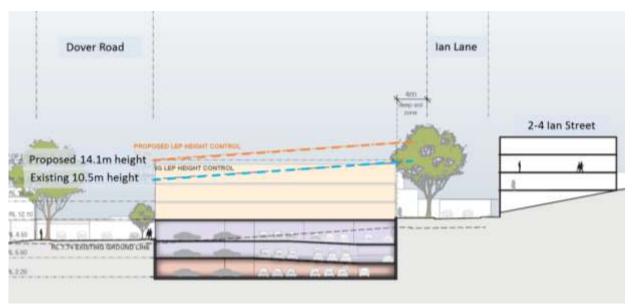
Section between Dover Road and Ian Lane showing the existing and proposed maximum building heights, concept for the site and surrounding existing buildings
